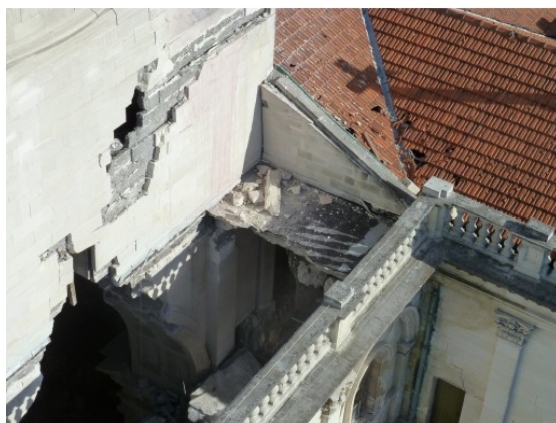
Collapse of a fraction of North rotunda wall, part of the adjacent RC flat roof and North interior arch.
